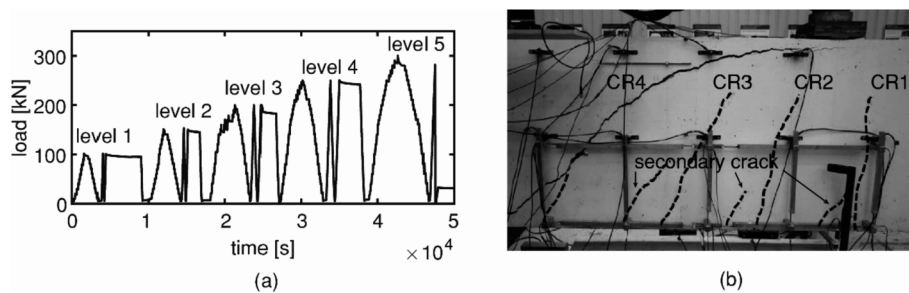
(a) Loading history and (b) crack patterns at failure.
